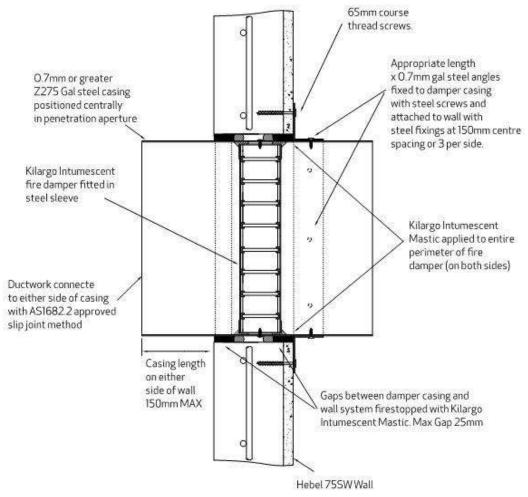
An Example of Fire Damper System (Source: Kilargo)
